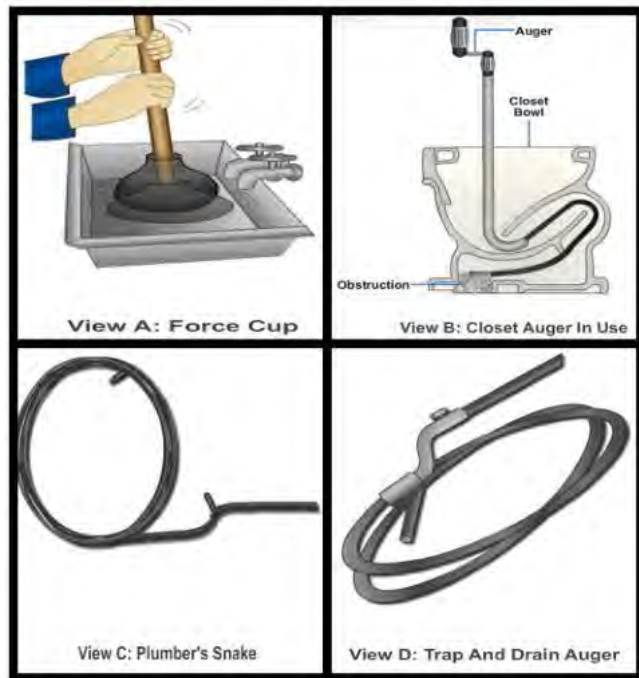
Tools for clearing stoppages in plumbing fixtures.
